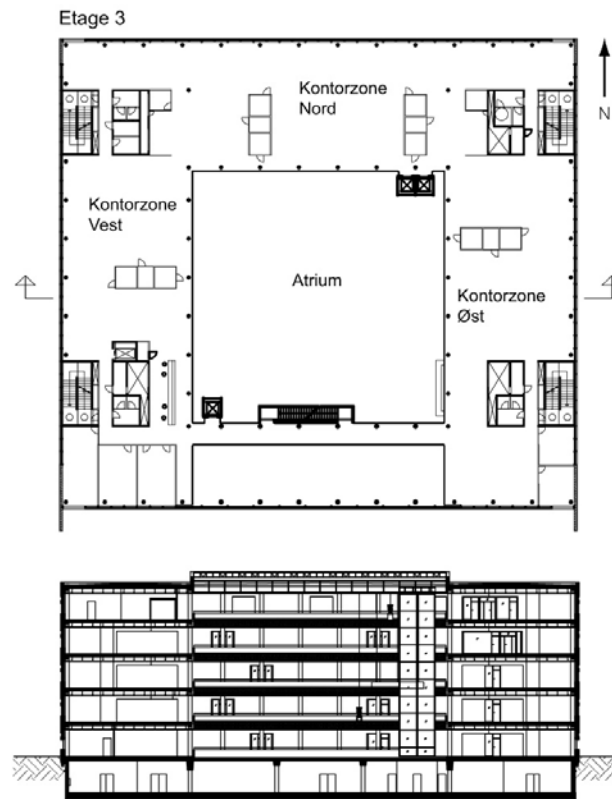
Plan and cross section of NCC Headquarters, Denmark.
